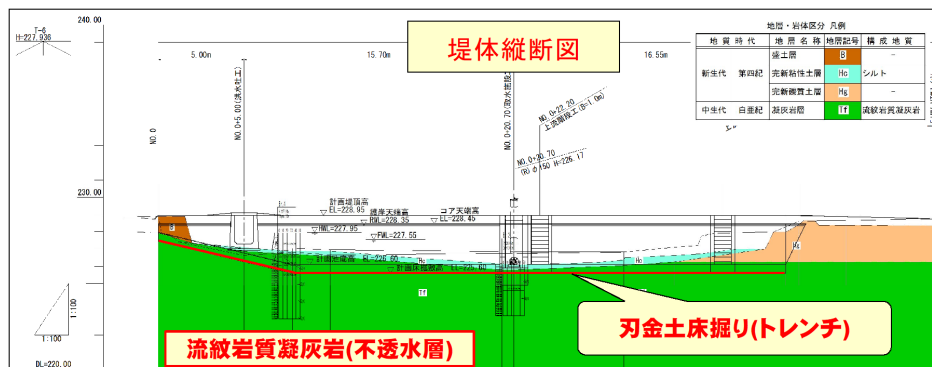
Longitudinal Section of the embankment 計画堤体縦断図
